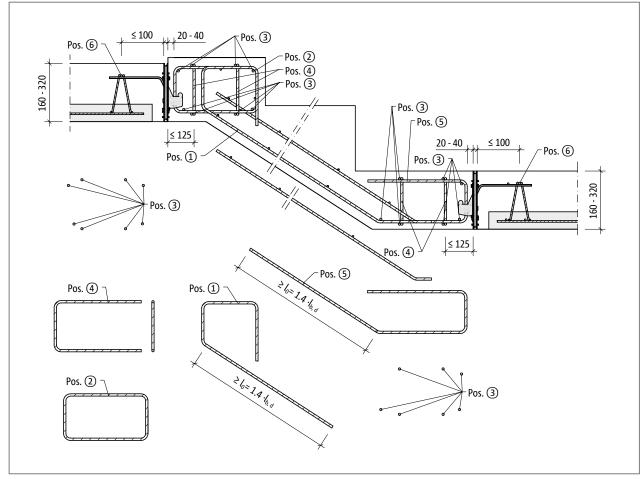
Schöck Tronsole® type T: On-site reinforcement with precast landing
